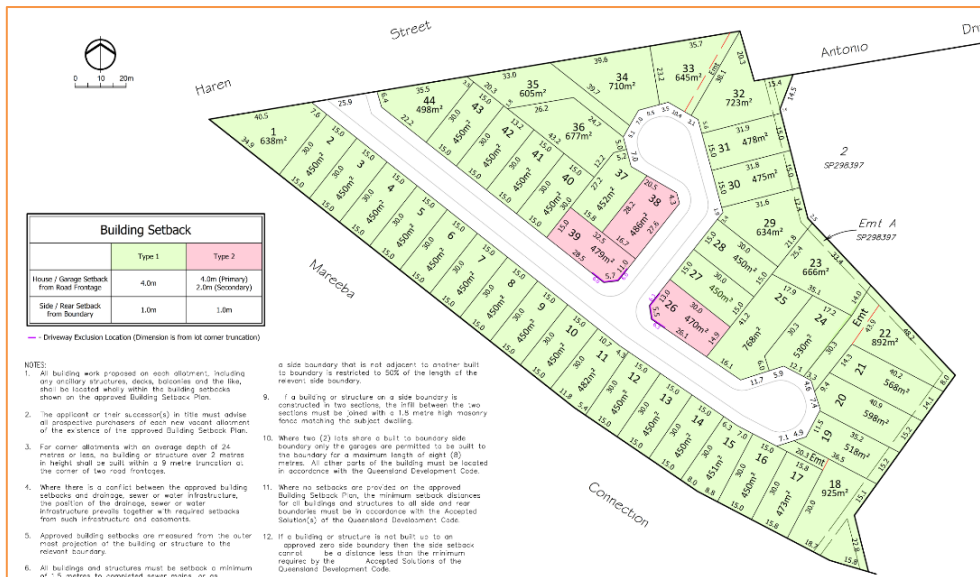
Extract of Building Setback Plan 34692/005 Rev B (Source: Brazier Motti 2026)
